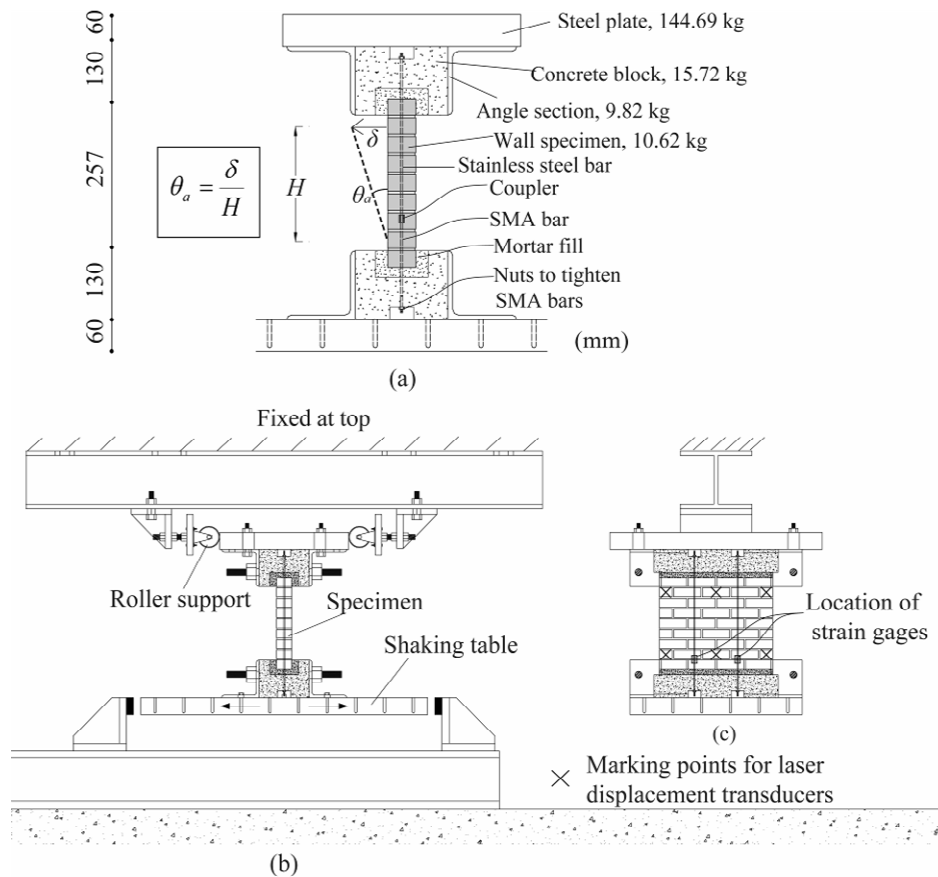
Out-of-plane test set-up on shaking table: (a) test set-up, (b) front view showing laser displacement cross-marks, (c) specimen with its major components.
